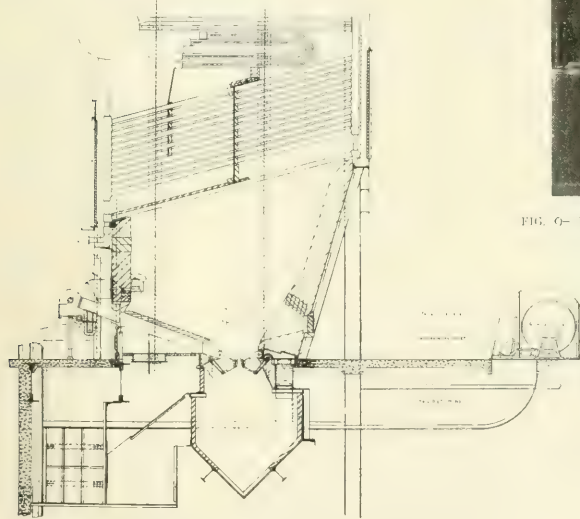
STOKER AND BOILER EQUIPMENT AT THE AMERICAN GAS & ELECTRIC COMPANY PLANT
